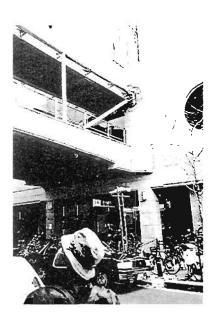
Footbridge Linking Buildings in Kobe Out of phase movements caused buckling of tubular steel members
